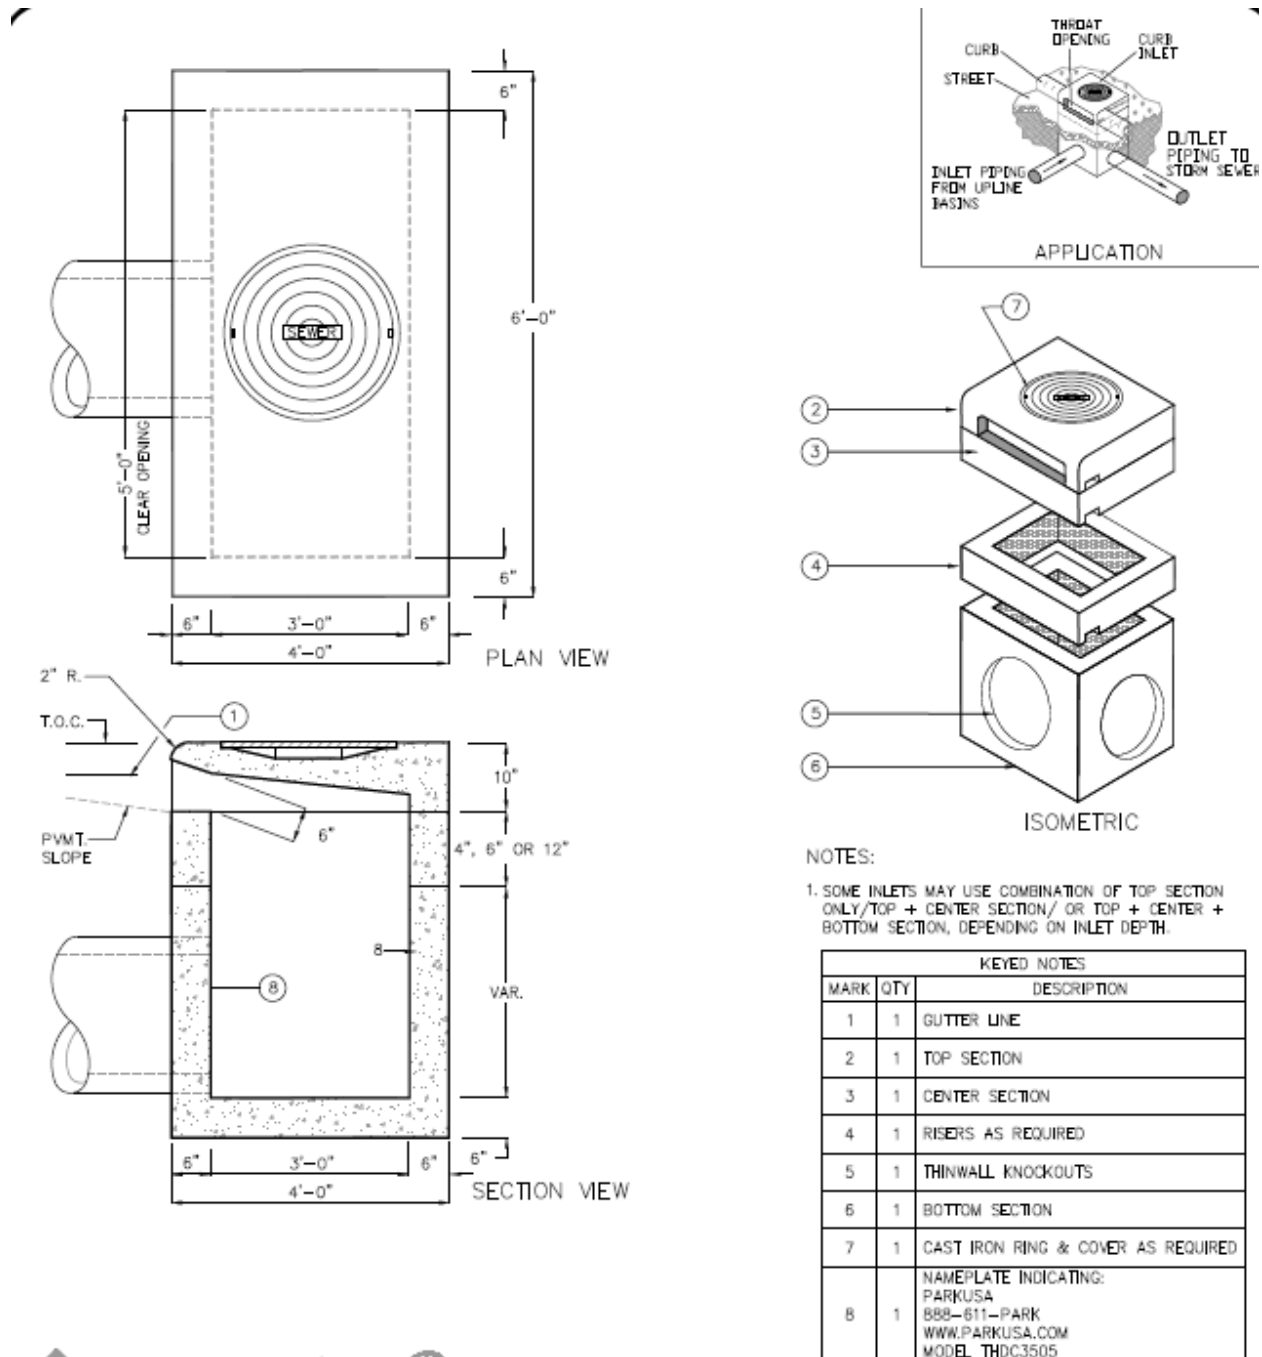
Example of Articulated Inlet—TYPE-C Precast Concrete Curb Inlet (9).
